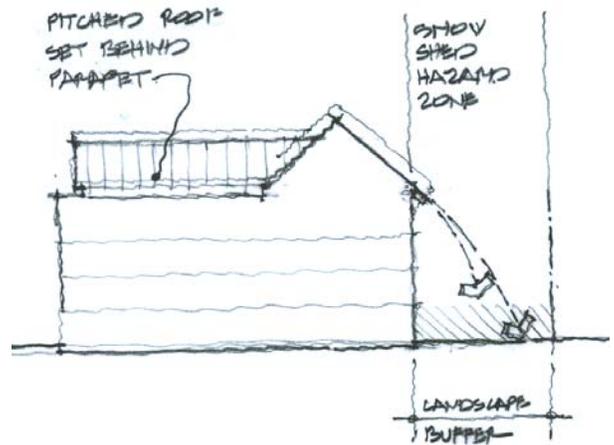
Pitched roof forms may be set behind a parapet wall where snow may be retained and removed or designed to shed in a defined area away protected from pedestrian and vehicular traffic.
